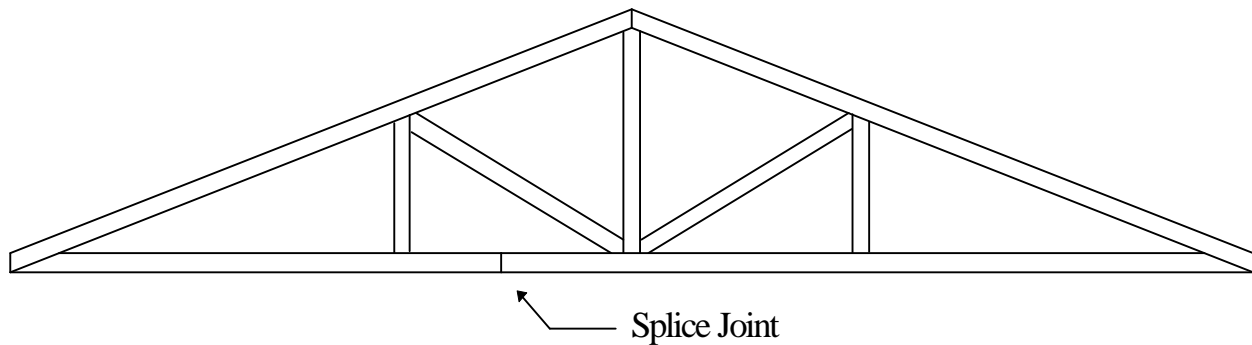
Typical bottom chord splice joint in a pitched roof truss.
